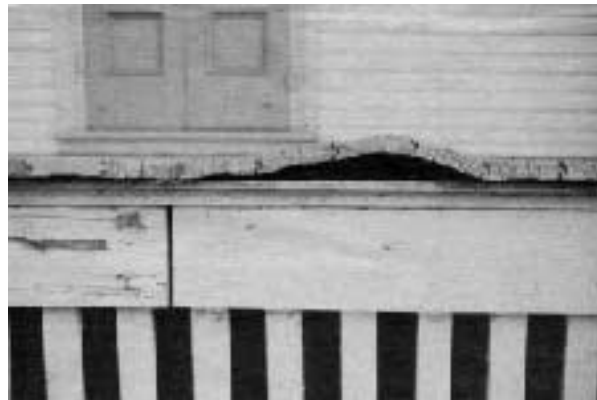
These flat-sawn boards have expanded in width and buckled due to moisture.
